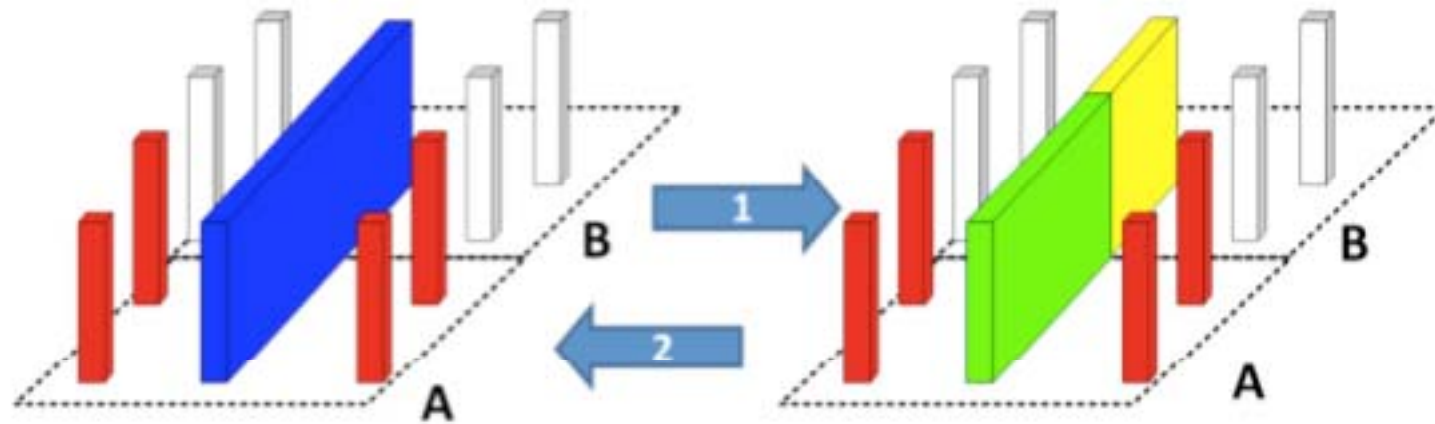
Non-Destructive Element Splitting allows you to define Zone construction zone boundaries without splitting elements.
